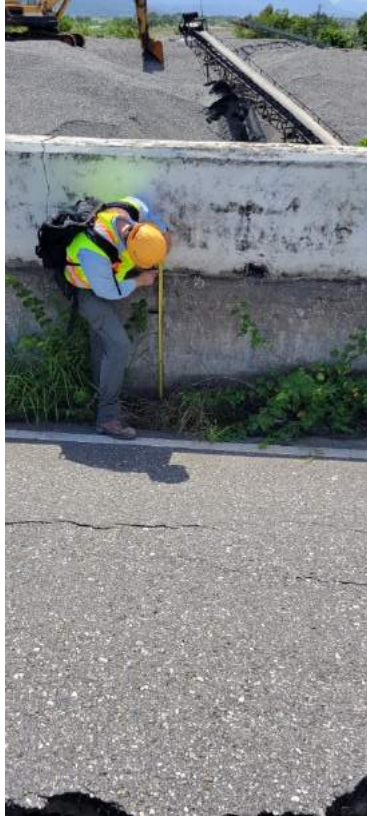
Roadway settlement at the south back-to-back concrete gravity wall in the west abutment (23.38629° 121.33811°)
